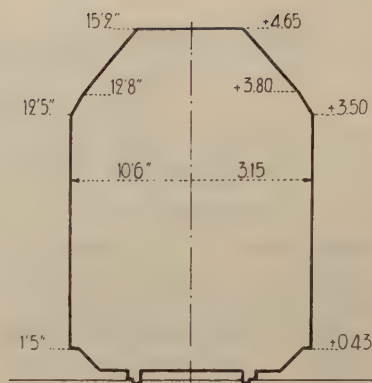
Loading gauge of the standard-gauge Balkan railways.
